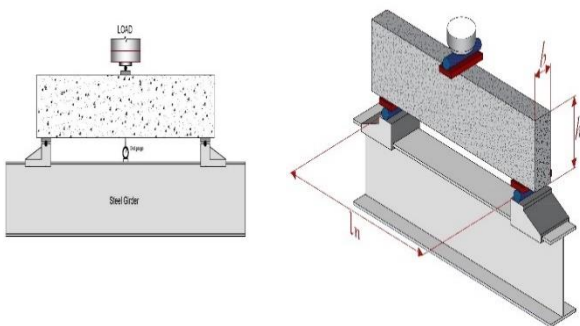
The Typical Arrangement and Setups of Directly Loaded Deep Beam.
